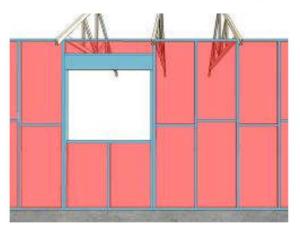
Example of Aligned Wall and Roof Structure Requiring a Single Top Plate
